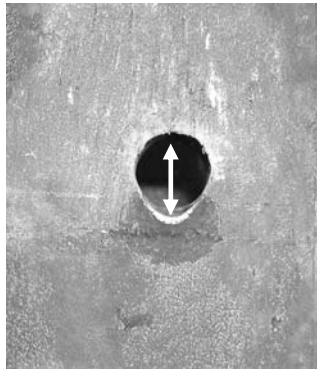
Deformation in plate on concrete side for Specimen KWIKB01
